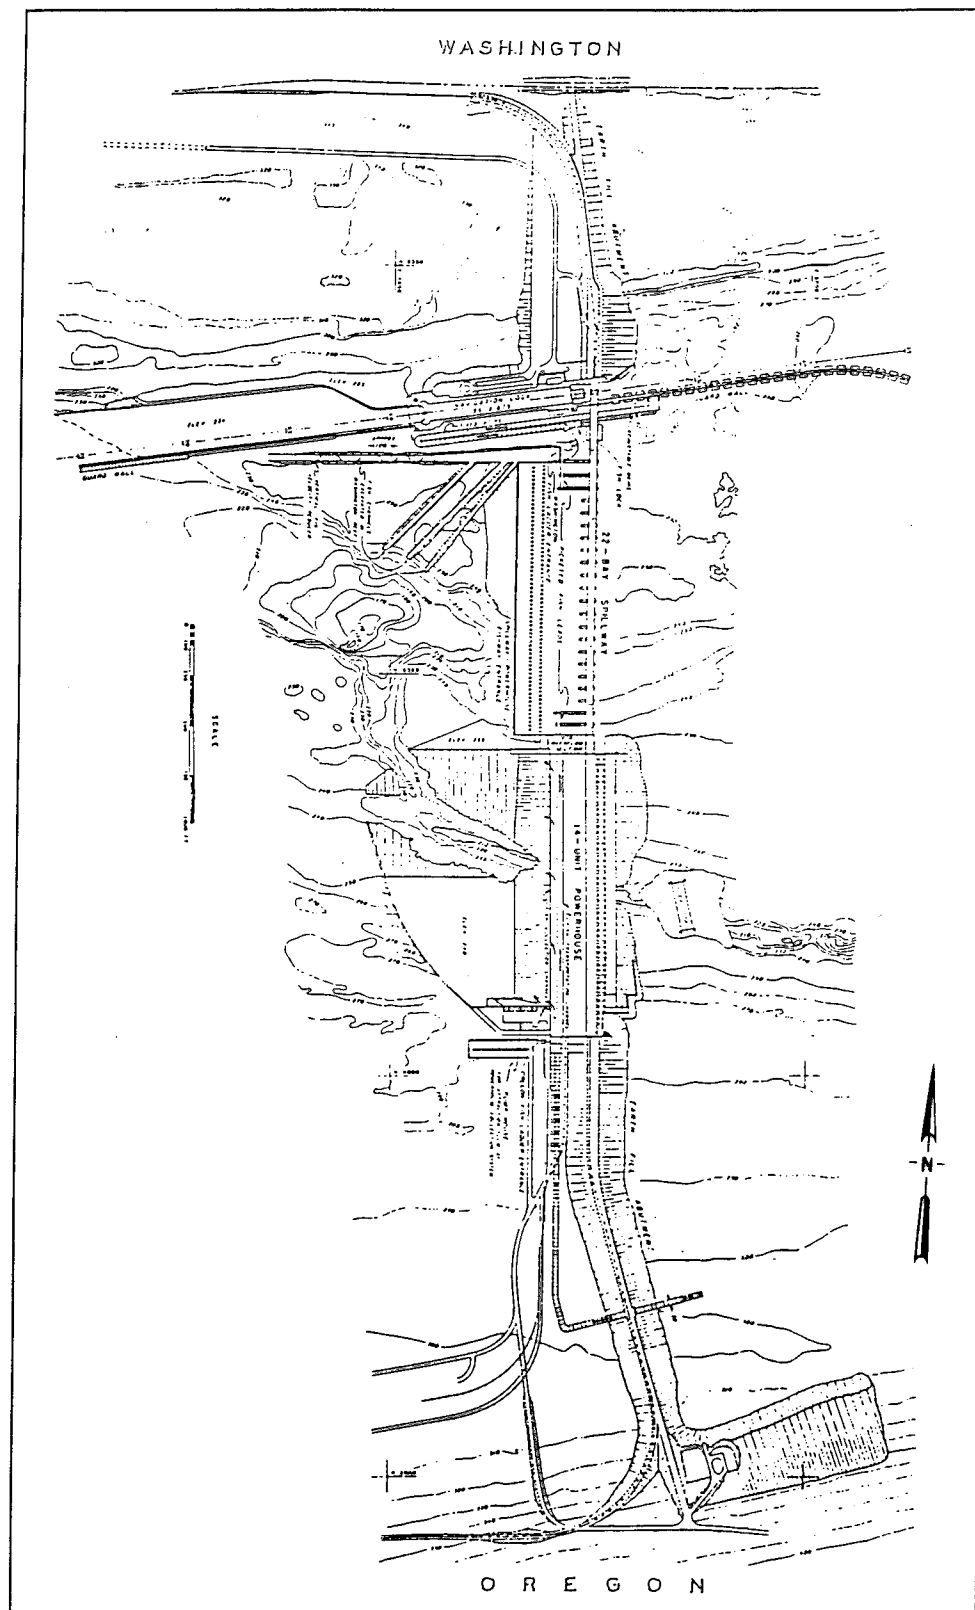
Plan view showing approach channel and location of the powerhouse and spillway
